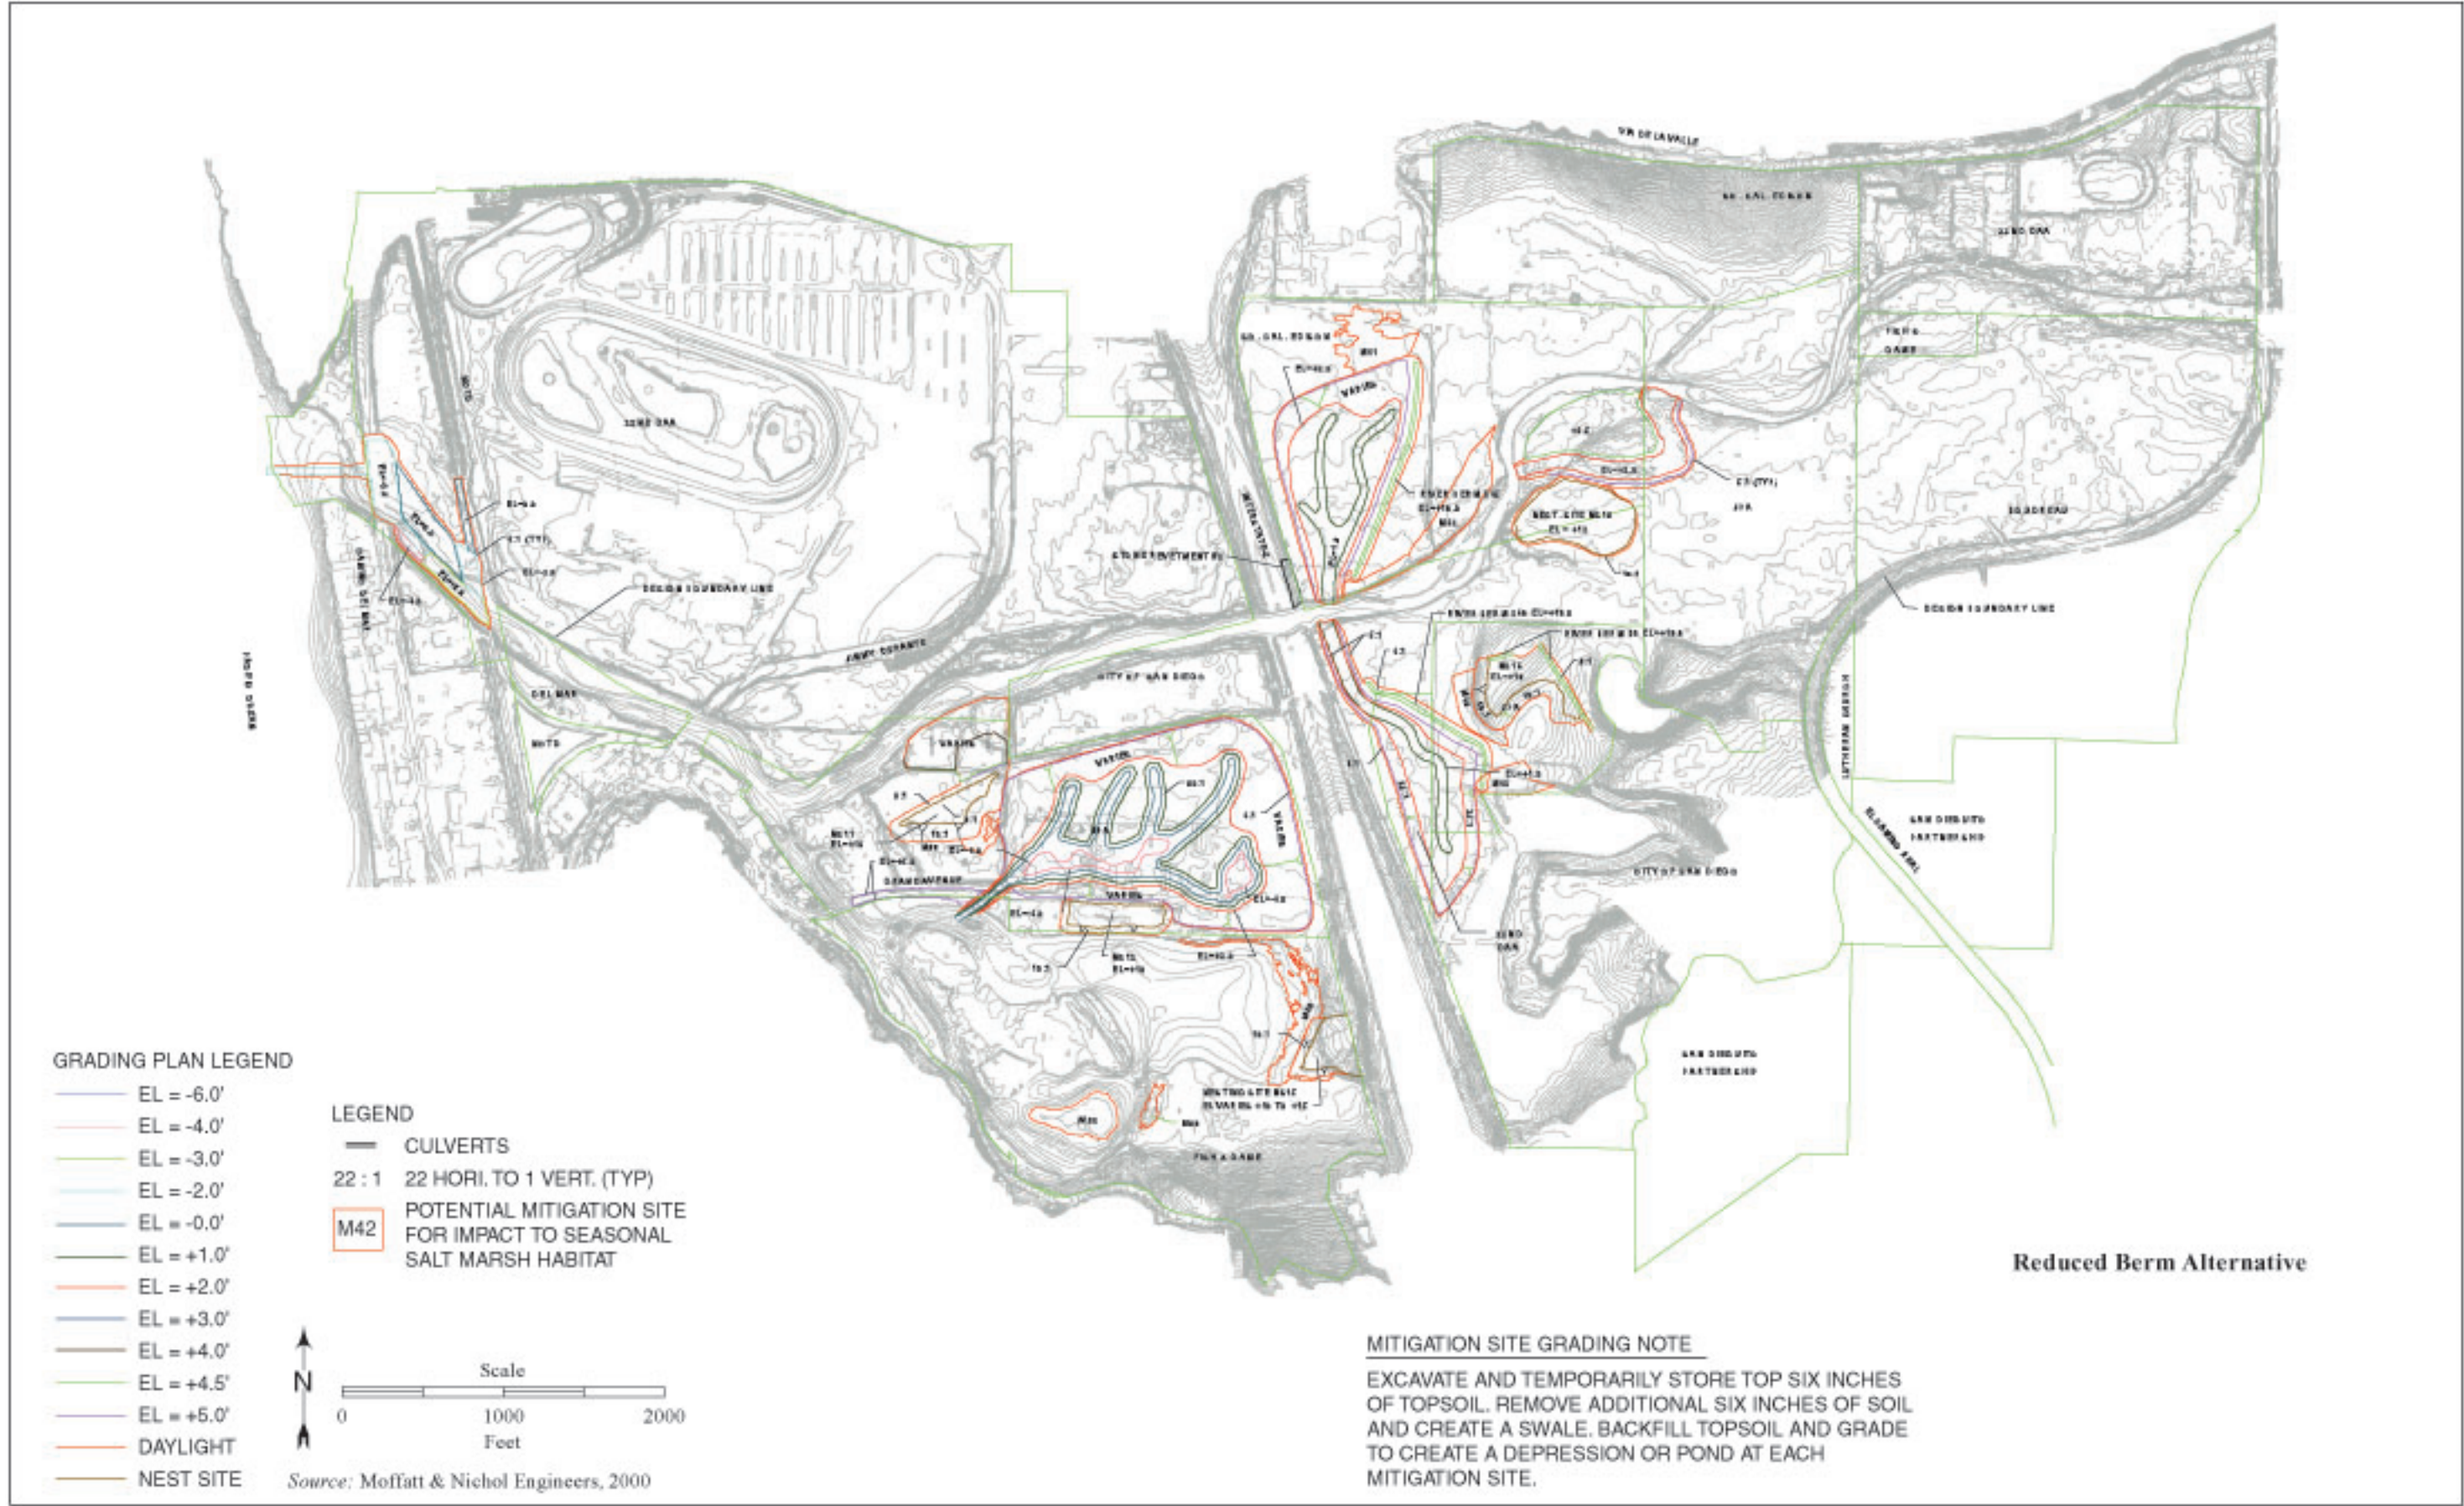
Grading Plan for Tidal Restoration and Nesting Sites - Reduced Berm Alternative
